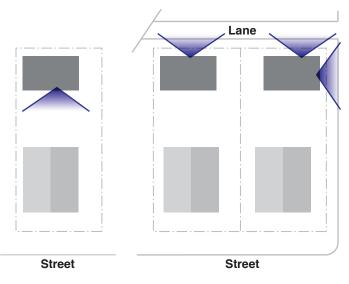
General siting of coach houses at the rear of a lot. For sites without a lane, the building front towards the interior yard. For sites with a lane, the building should front towards the lane.
